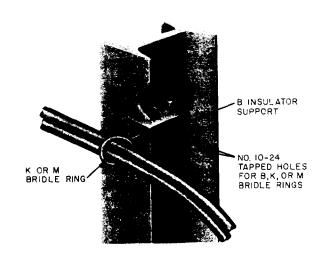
Installed K or M Bridle Ring Using B Insulator Support
